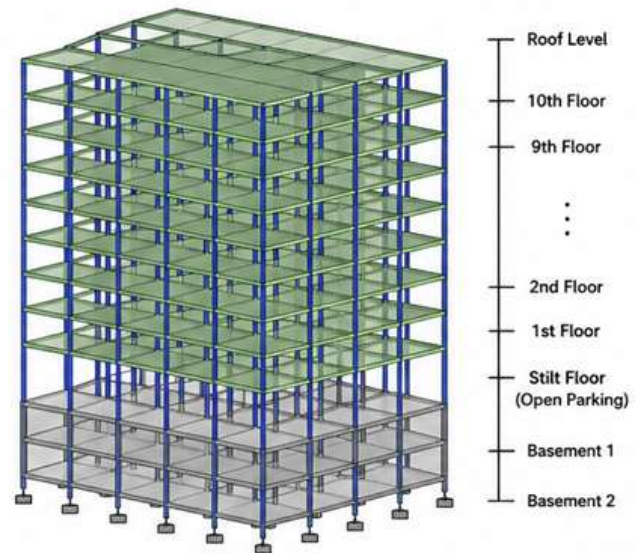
Three-Dimensional Structural Model of the Building in STAAD.Pro
